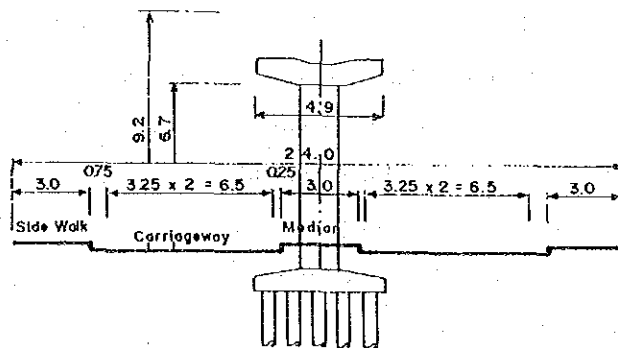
(1) Standard Cross-Section of Route 2
